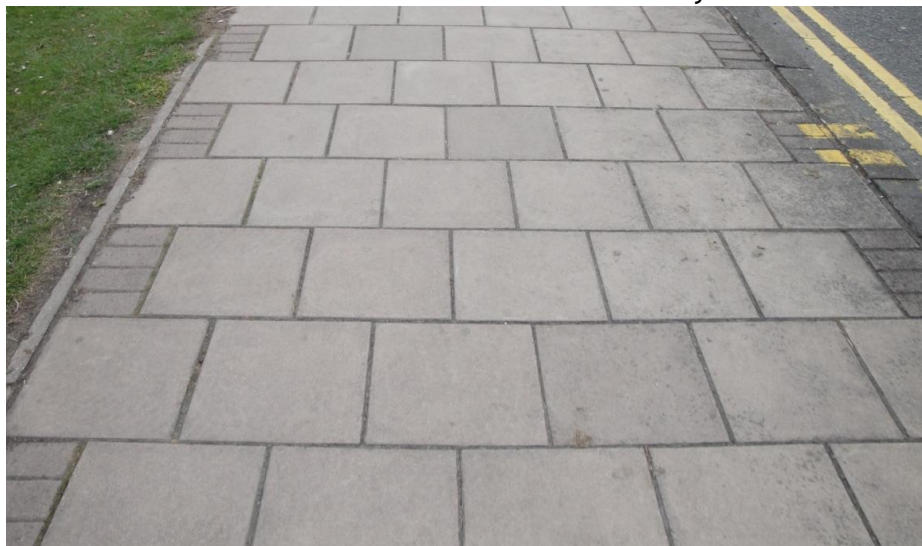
Photos to illustrate the different types and sizes of concrete slab paving currently used. Where repairs are needed a like for like approach should be taken
